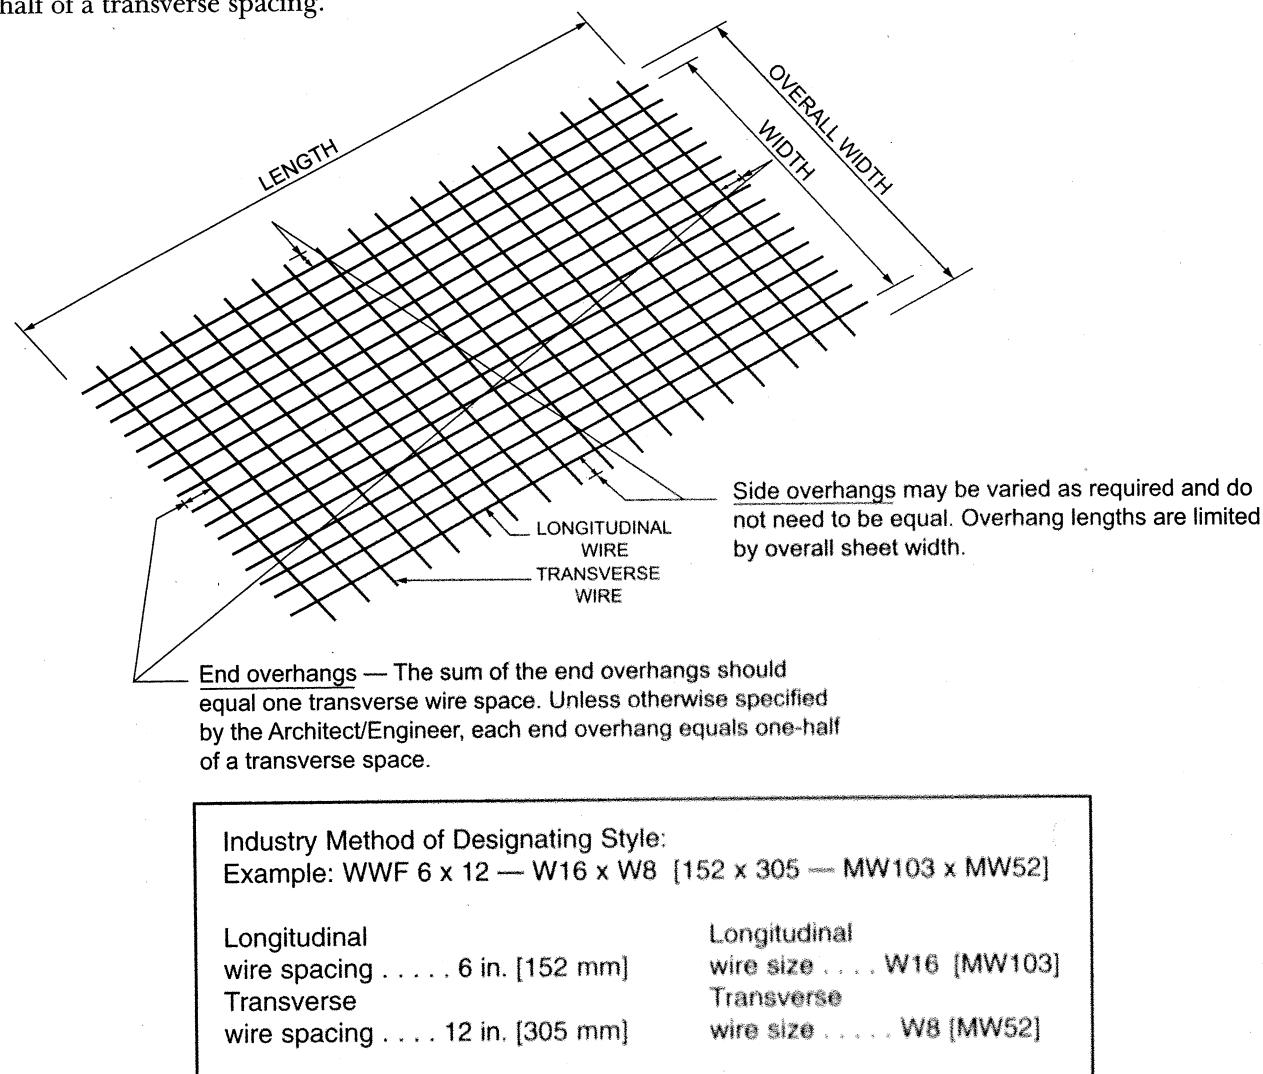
STYLE IDENTIFICATION OF WELDED WIRE FABRIC
